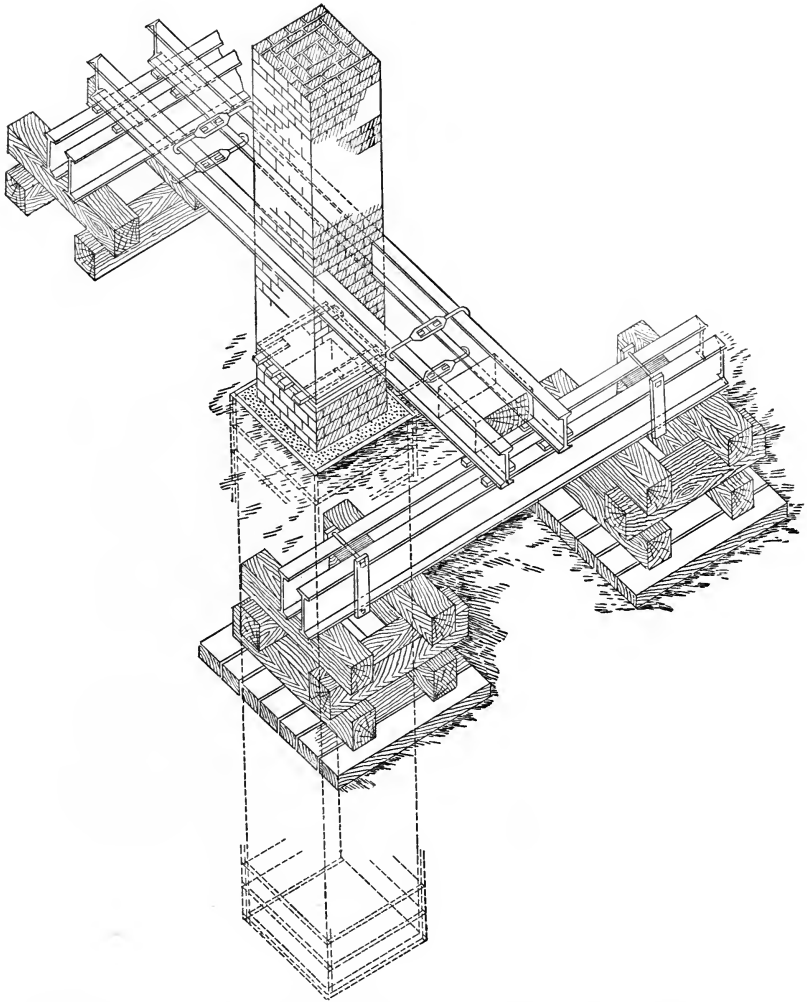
Typical Needling Method Showing Underpinning Pier and
